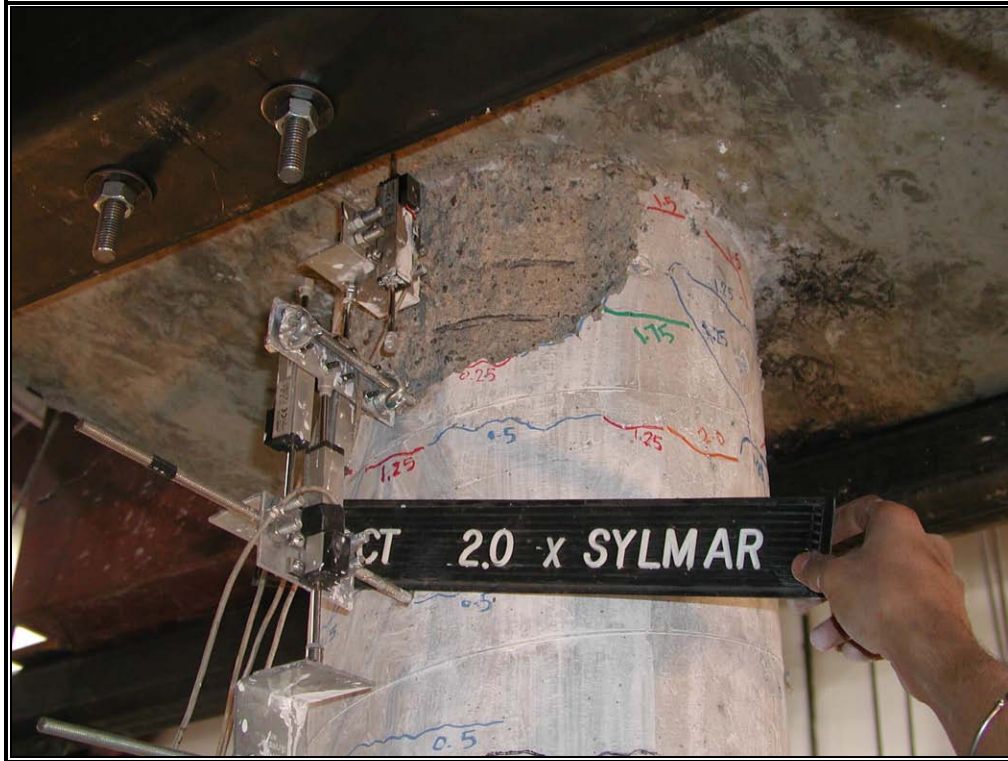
Concrete Spalling on West Side of East Column
